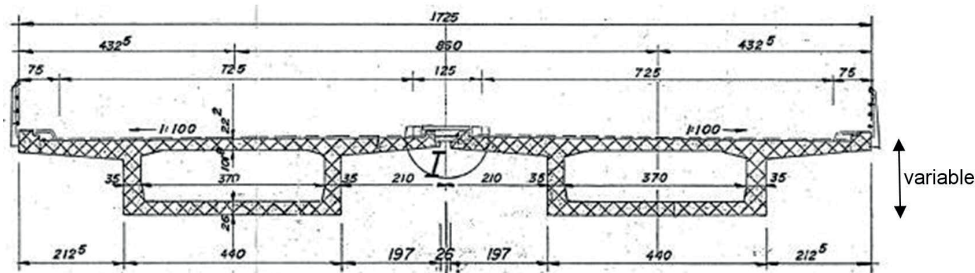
A typical cross section of the Hartel bridge (dimensions in cm)
